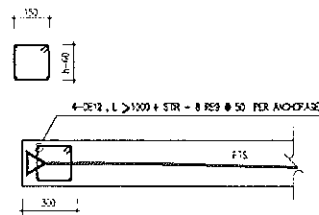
REINFORCEMENT FOR SLAB CONNECTED TO EXTERIOR BEAM
